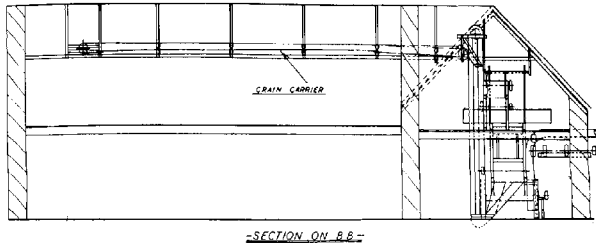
Typical arrangement of threshing machine and accessories in barn
